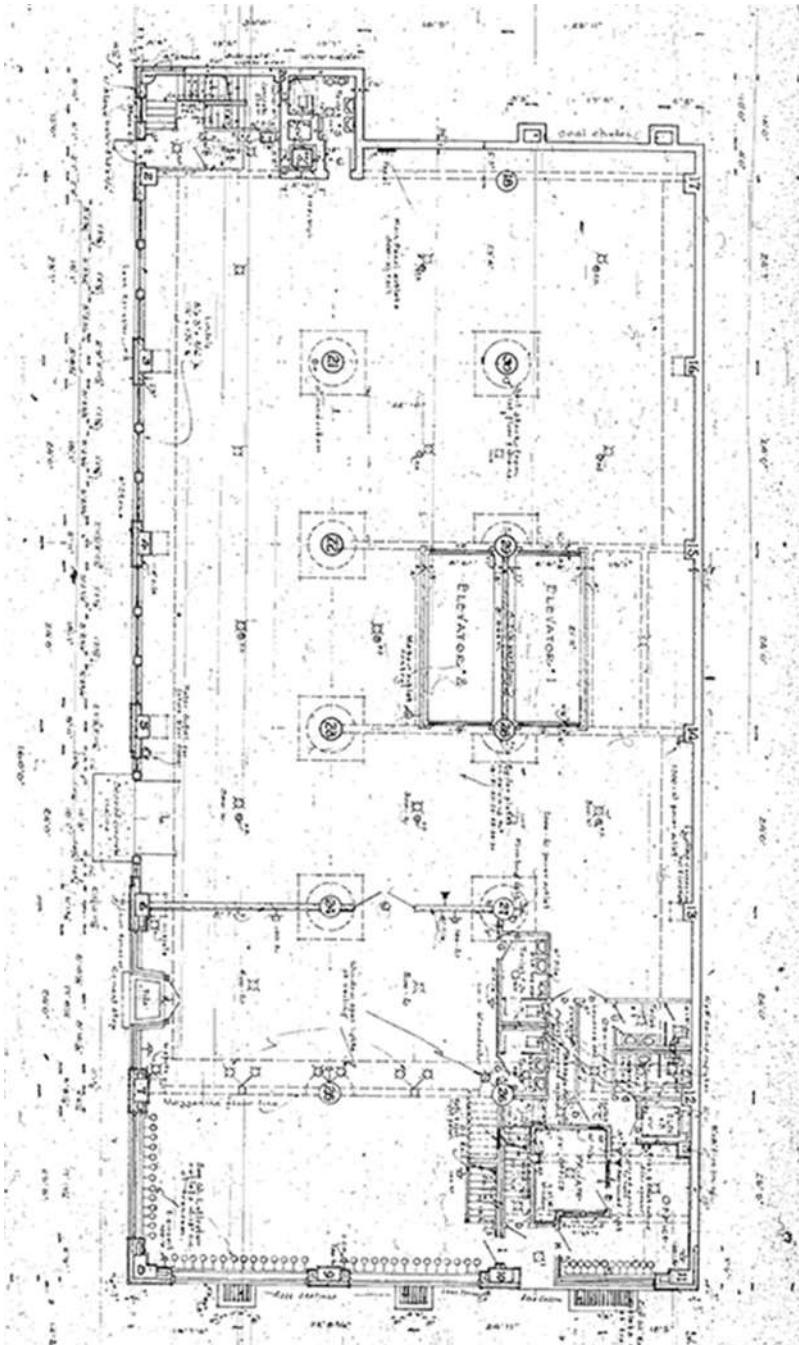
Historic First Floor Plan. (Eschweiler & Eschweiler, 1928)
